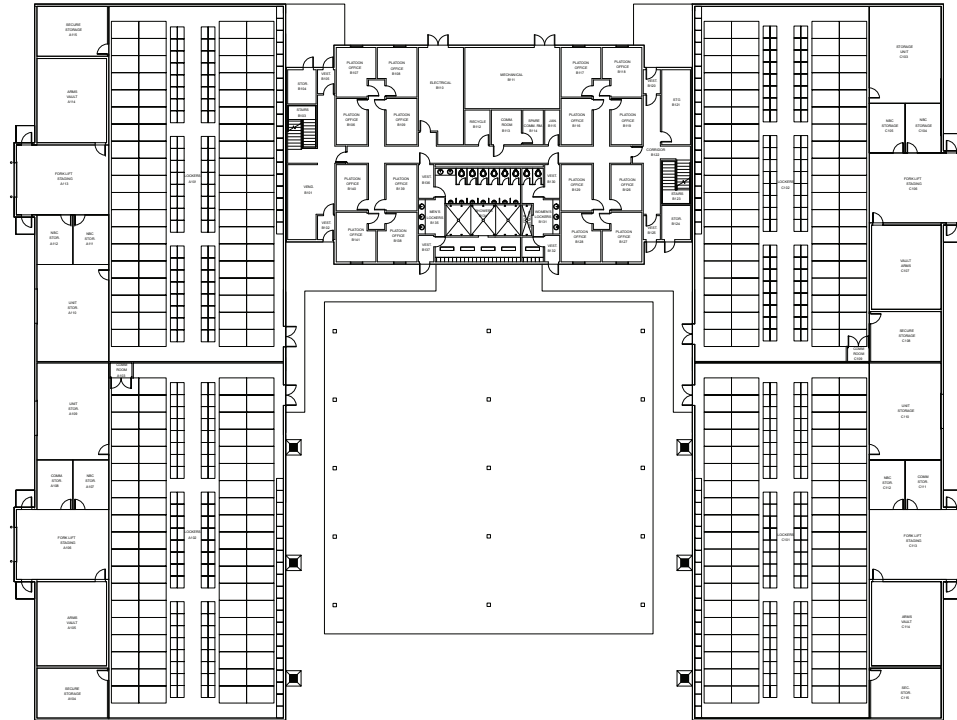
Conceptual Patriot Battalion COF Floor-plan
